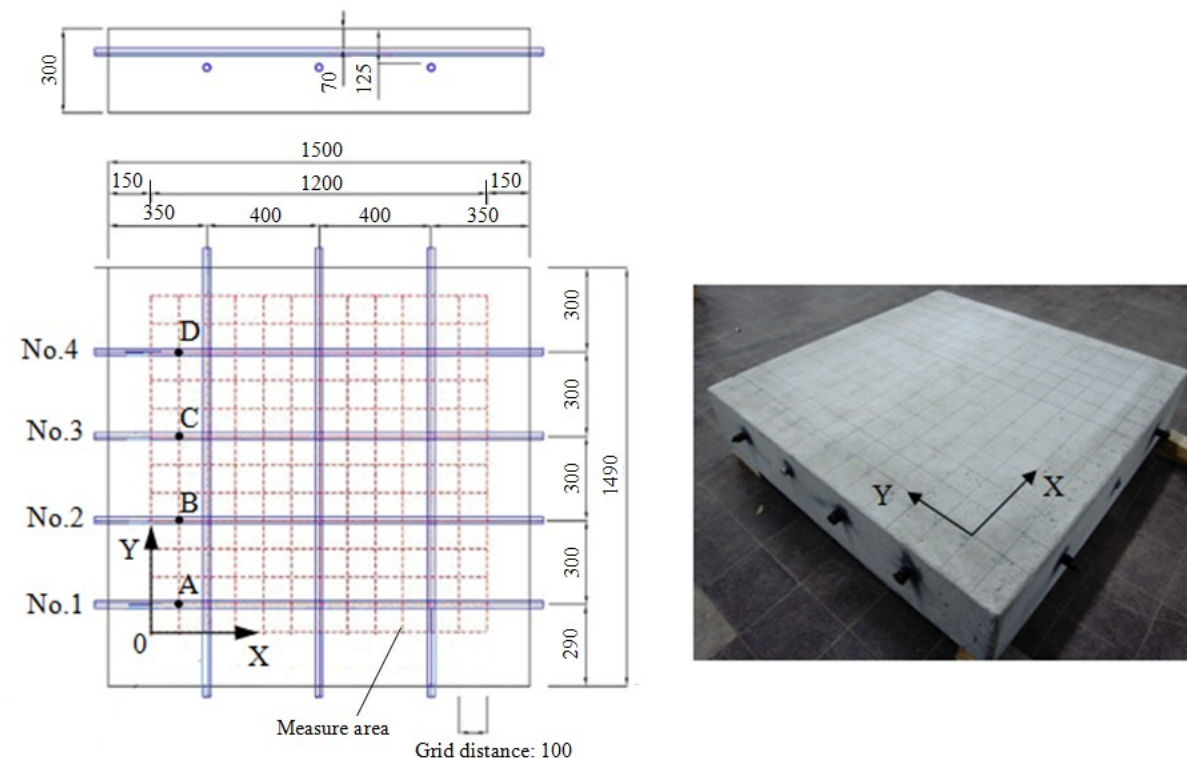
Drawing of the test specimen and the measurement grid (unit: mm).
